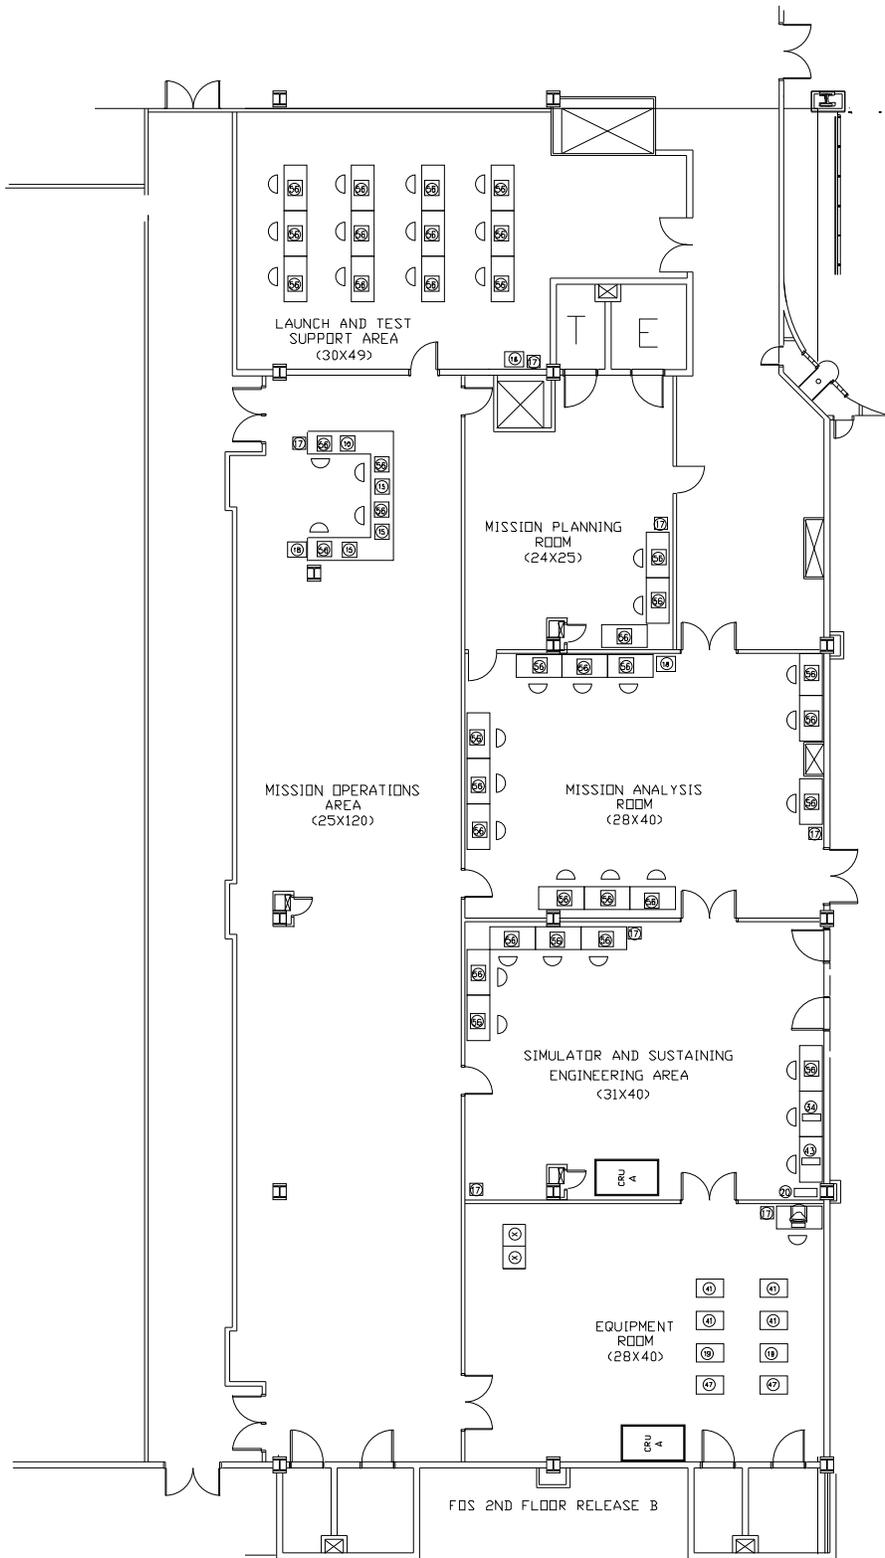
FOS Floor Plan — Second Floor (Release B)
